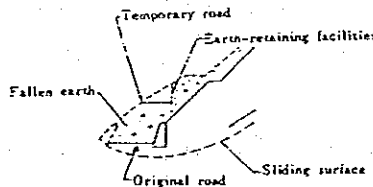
DETOUR ON COLLAPSED EARTH WITH EARTH RETAINING WALL
